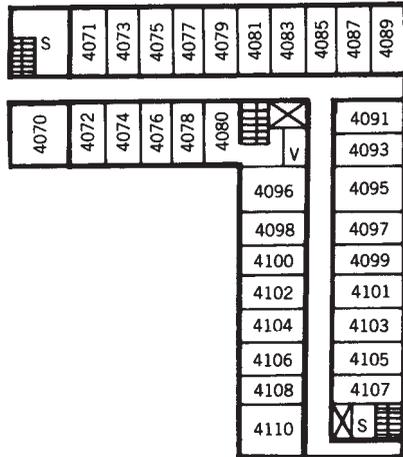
Floor plan layout of the model hotel; 33 fourth-floor rooms.
